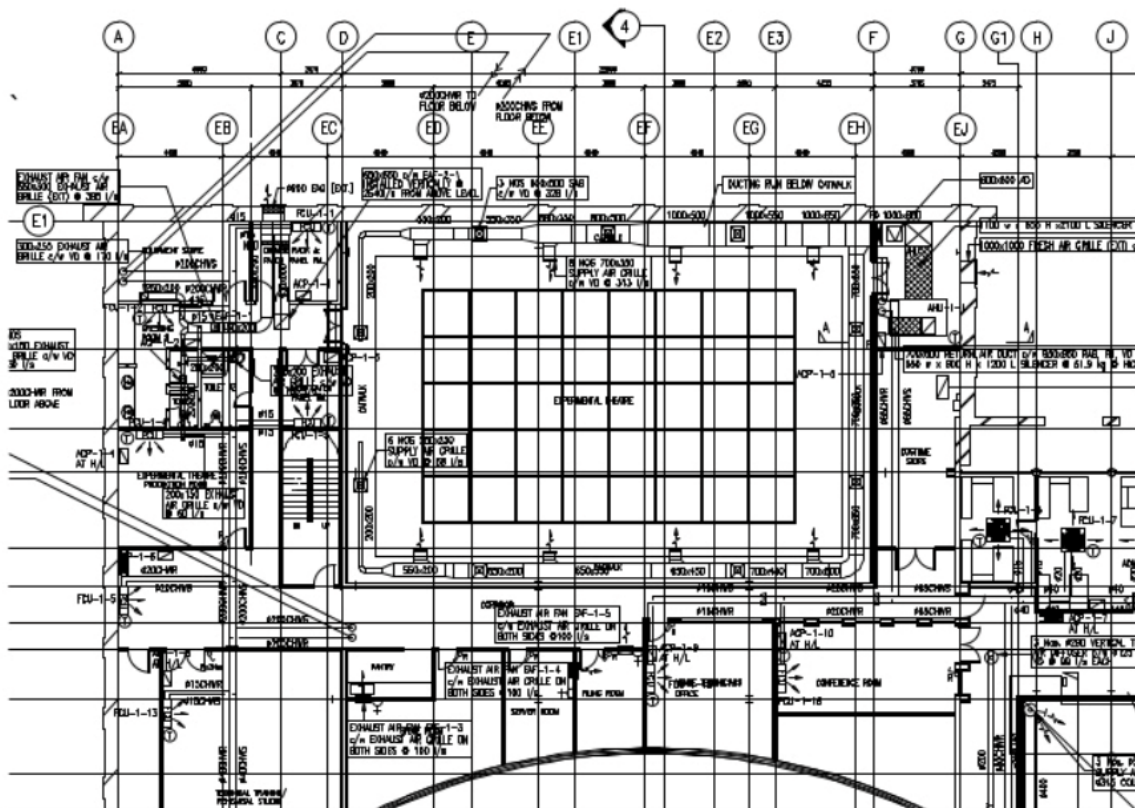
Plan drawing of how Air Diffuser are connected through ductwork
